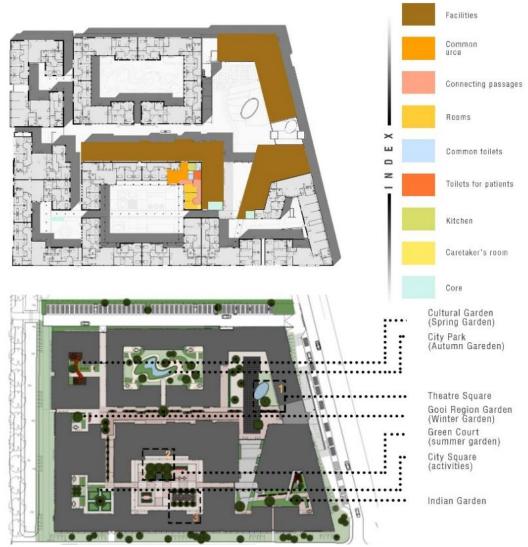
Plan of Hogeweyk Dementia Village *Source:* Author.
